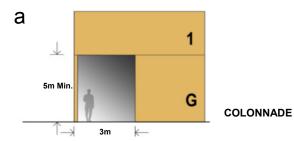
Historically, Hong Kong employed extensive use of colonnades within shop house development.
